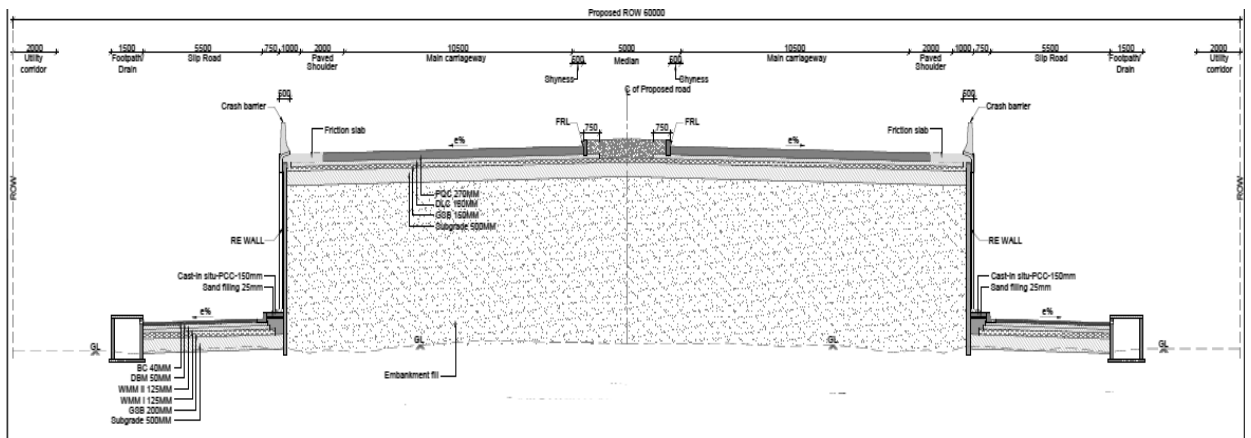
TCS-6C Typical Four Lane Underpass Cross Section With Slip Roads In Bypass & Realignment
